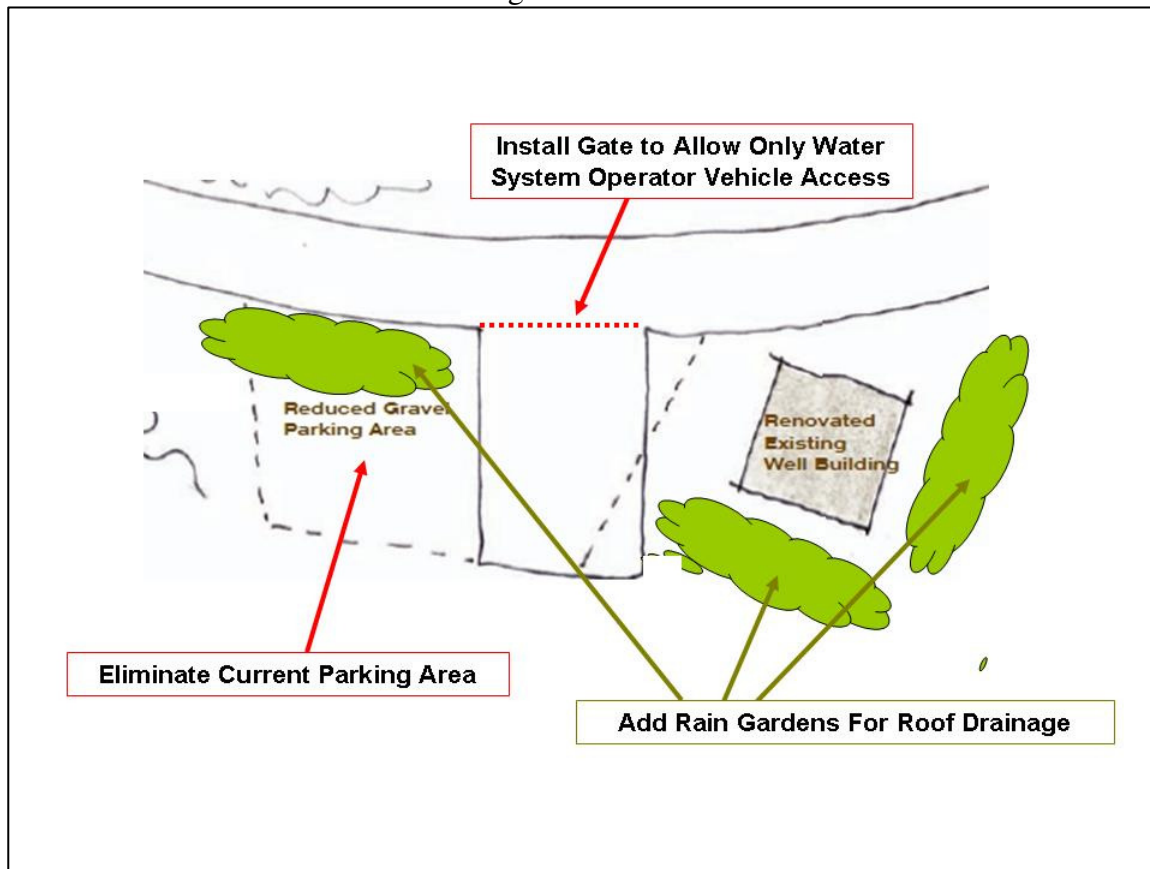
Proposed Site Improvements for Gilman Park Well
